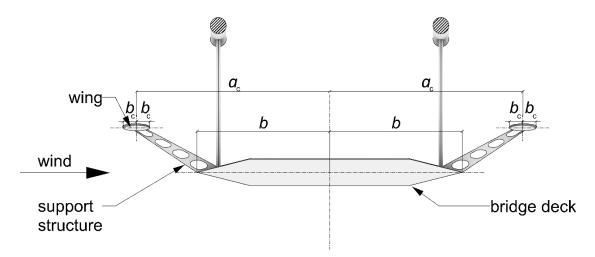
Bridge deck with eccentric-wing flutter stabilizer - cross section
